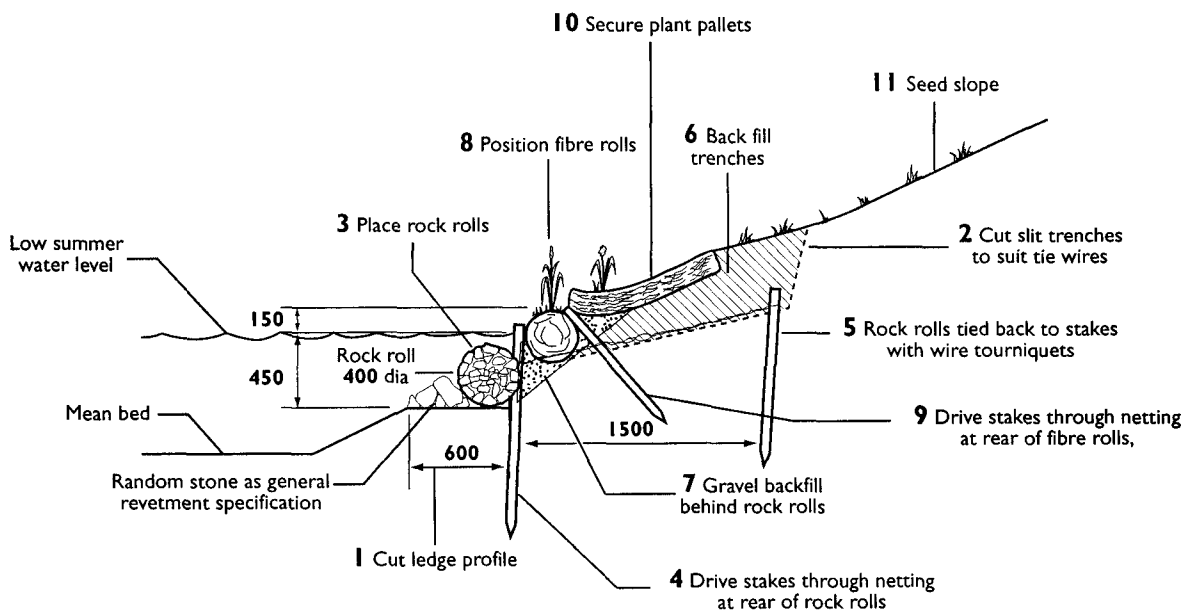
Detail of transition revetment (plant rolls over rock rolls) and installation
